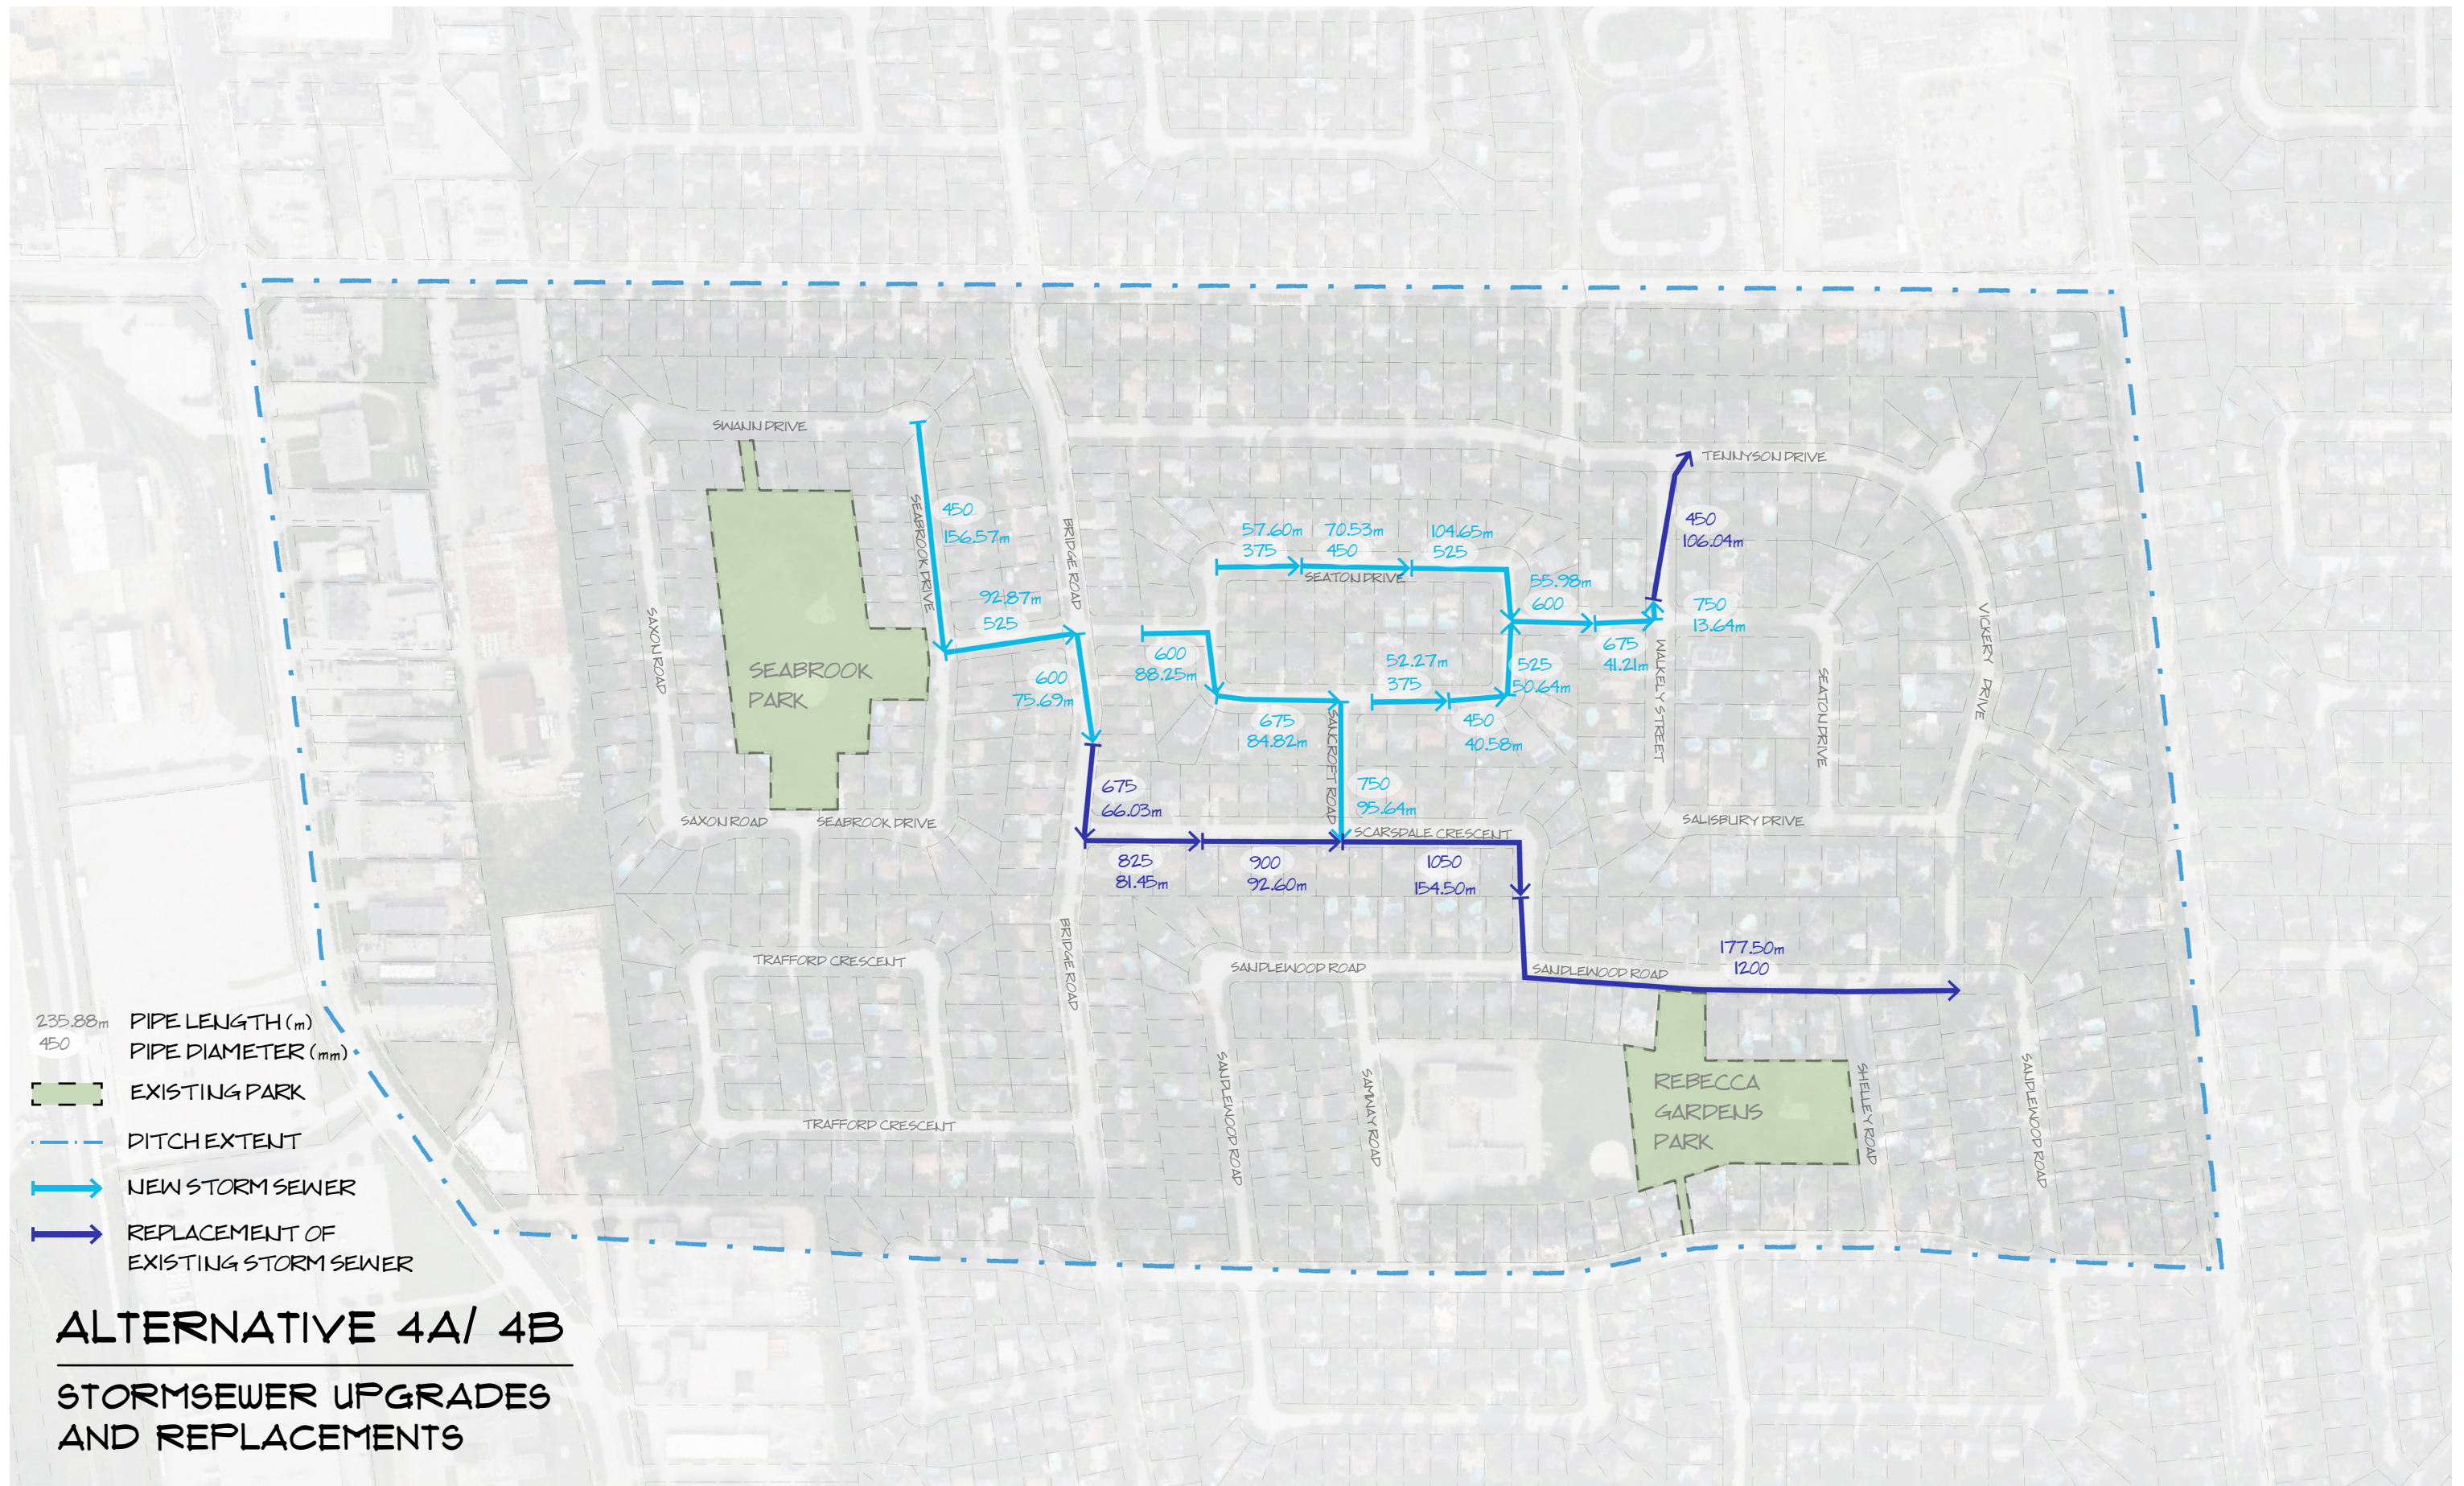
Alternative 4A/4B - Storm Sewer System Improvements
